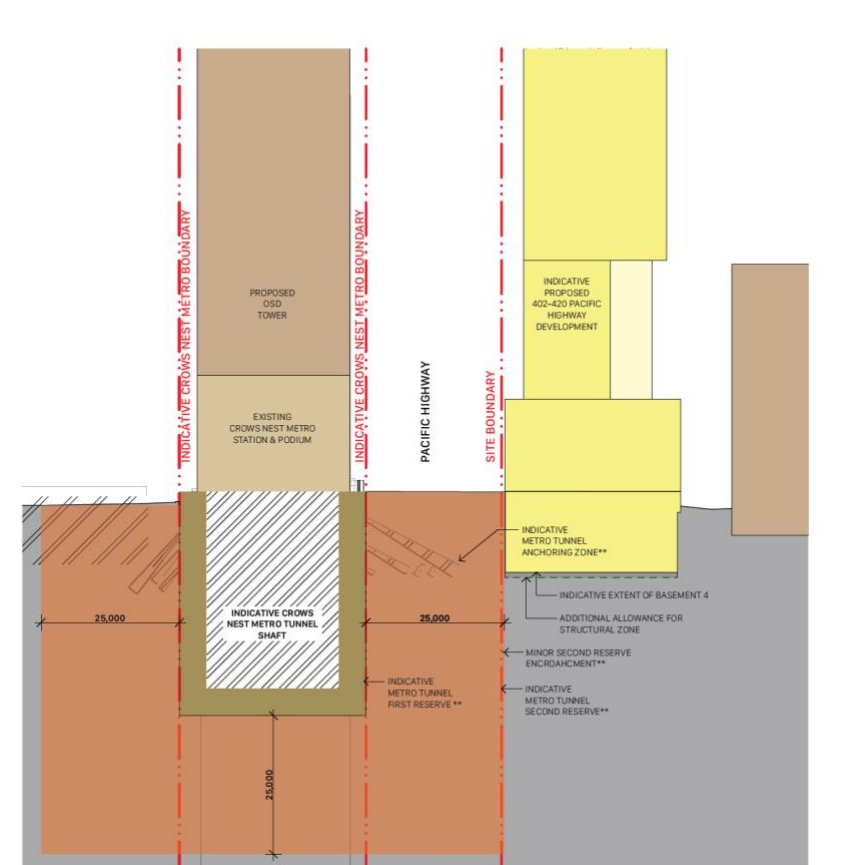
Metro tunnel cross section (Source: FJC Studio 2025)
